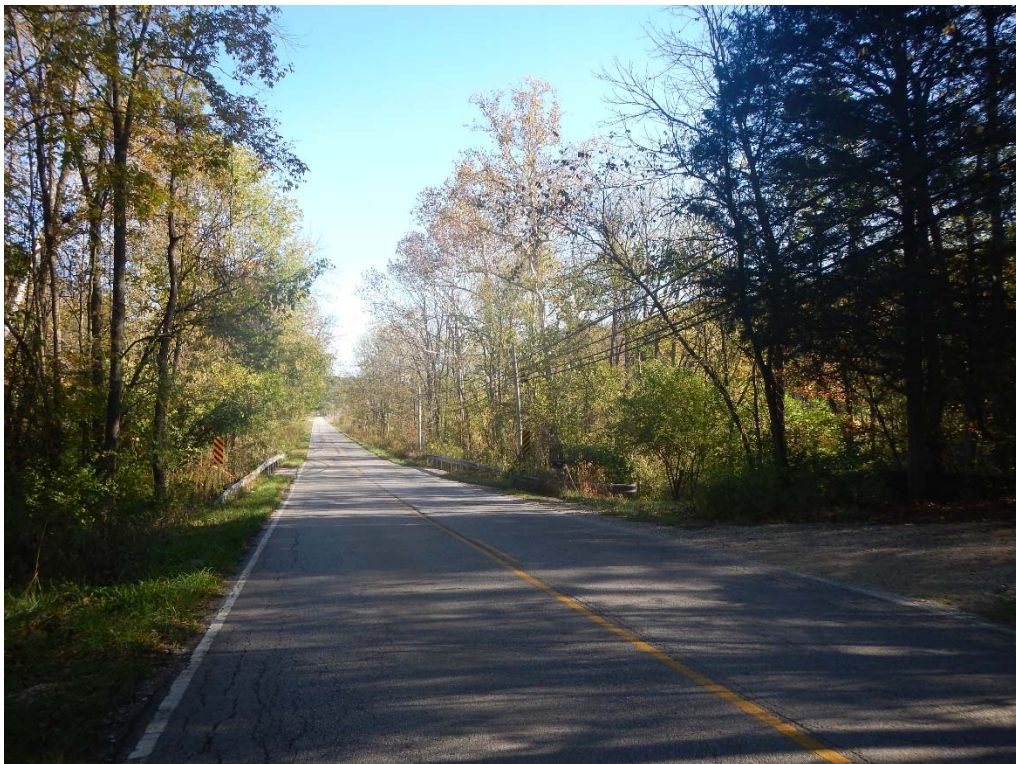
Facing northeast along Old SR 37 toward crossing of a segment of Muddy Fork.
